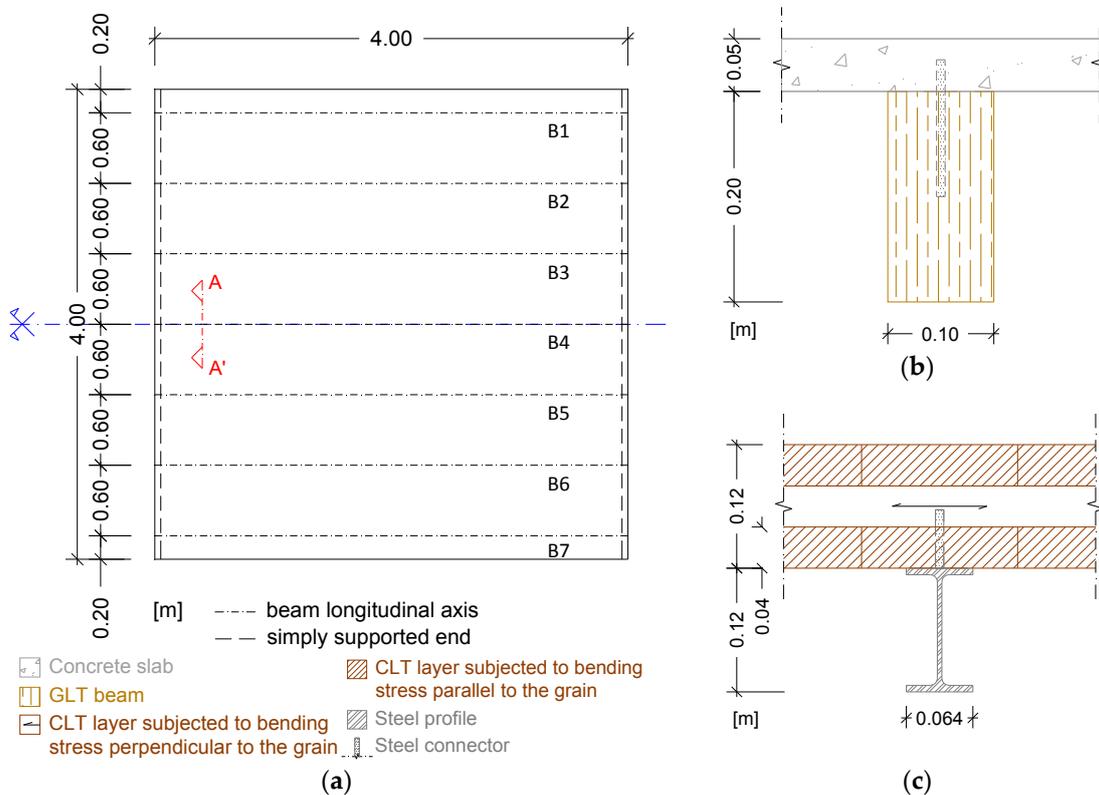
Composite floor geometry and components: (a) plan view scheme; cross section A-A': (b) TCC floor; (c) CLT-S floor.
